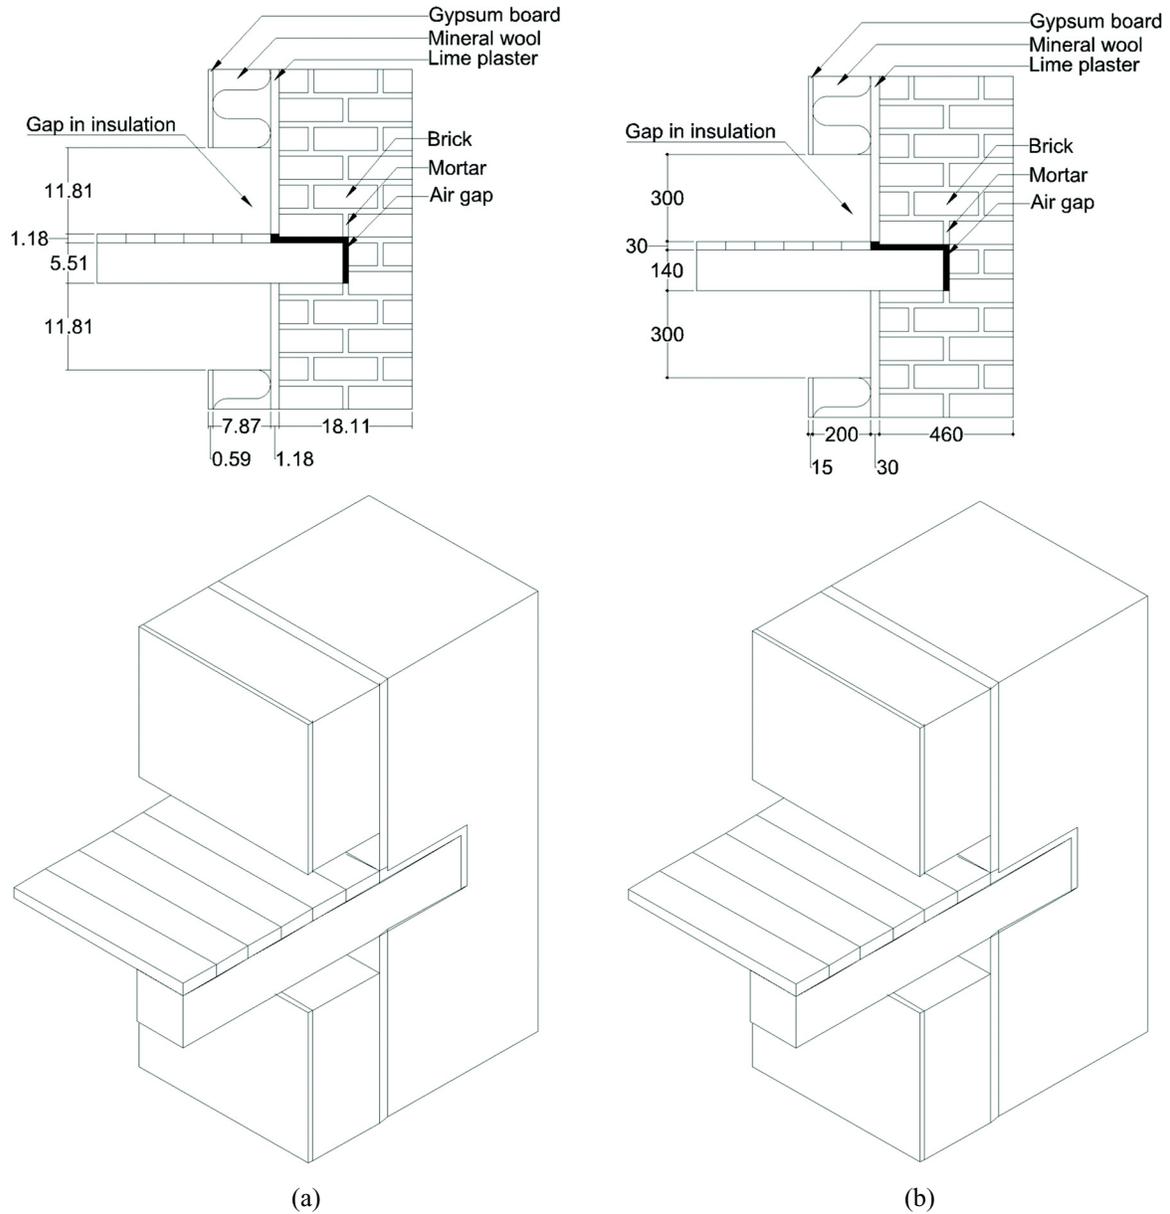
Masonry wall with wooden beam end after retrofitting showing the air gap between the floor and insulation for the two-dimensional and three-dimensional model in (a) I-P units and (b) SI units.
